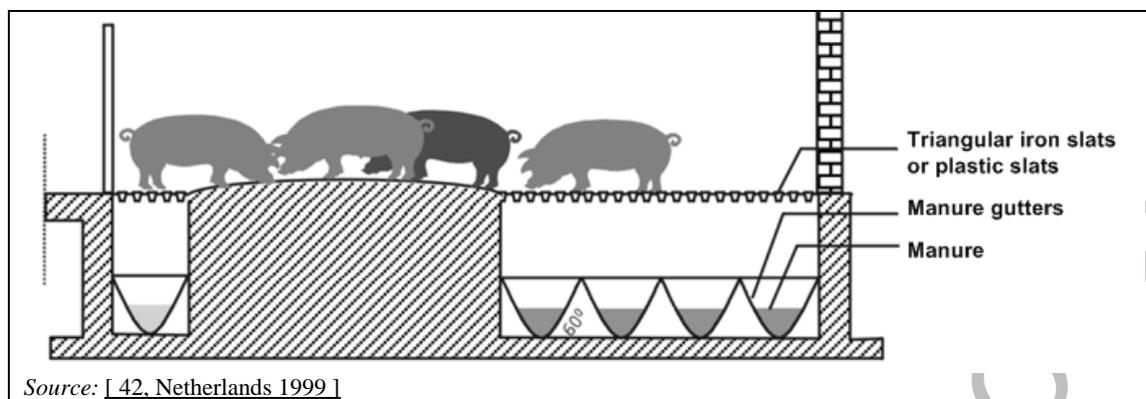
Convex floor with triangular iron slats in combination with a gutter system
